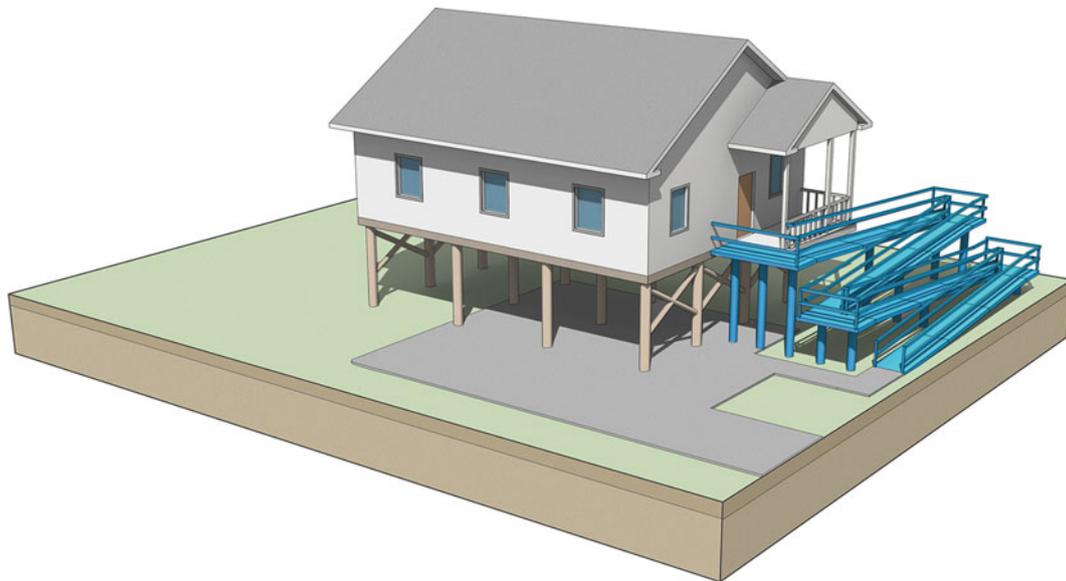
Diagram of an elevated structure on piles with a ramp (Credit: Giovanni Coakley, LSU School of Architecture)
